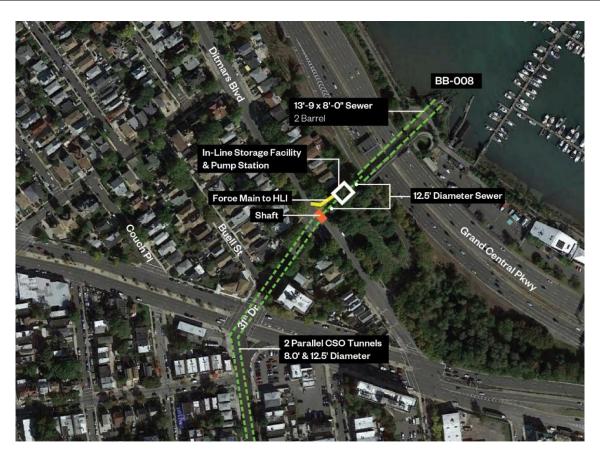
Layout of Alternative 9-3 - Outfall Storage for BB-008
